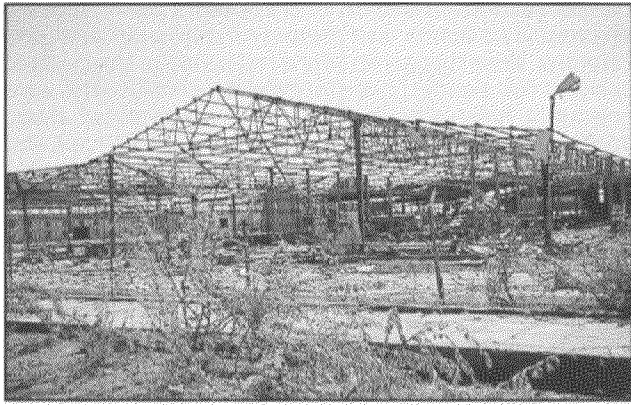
· Roof Cladding damage of an Industrial Structure
